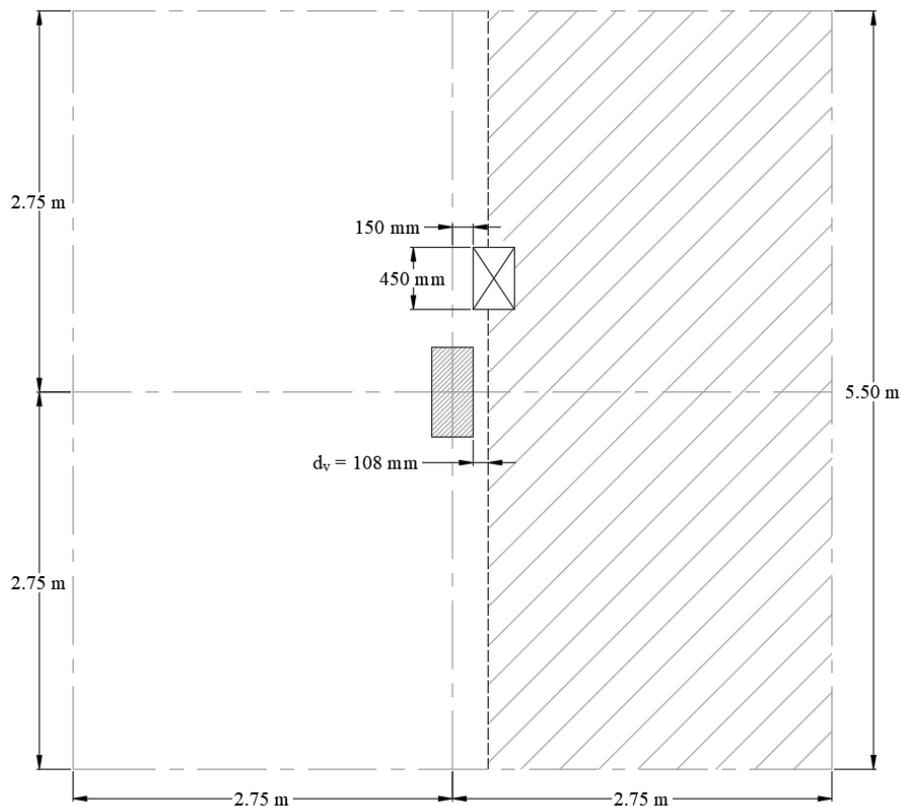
Critical Section for One-Way Shear (Slab with Opening)
